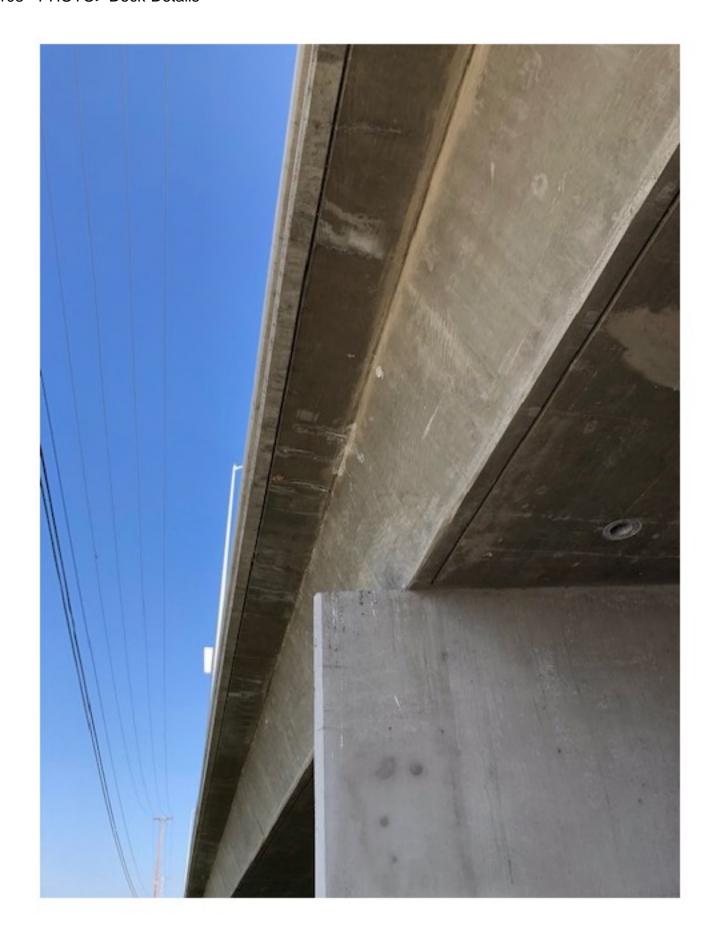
Deck overhang with transverse cracks with efflorescence
